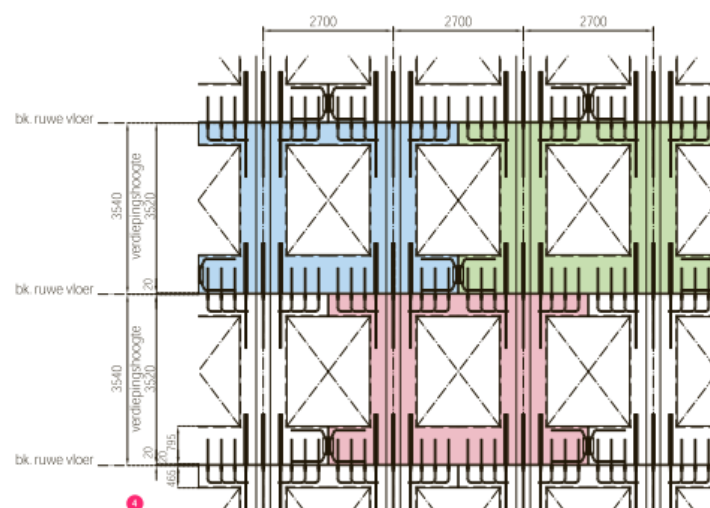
Load bearing facade element with small tolerance [Robbemont 2011]
